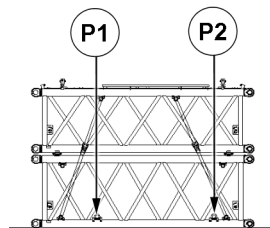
WA-frame 1 intermediate section 4 m and WA-frame 2 intermediate section 4 m unit fastening points
